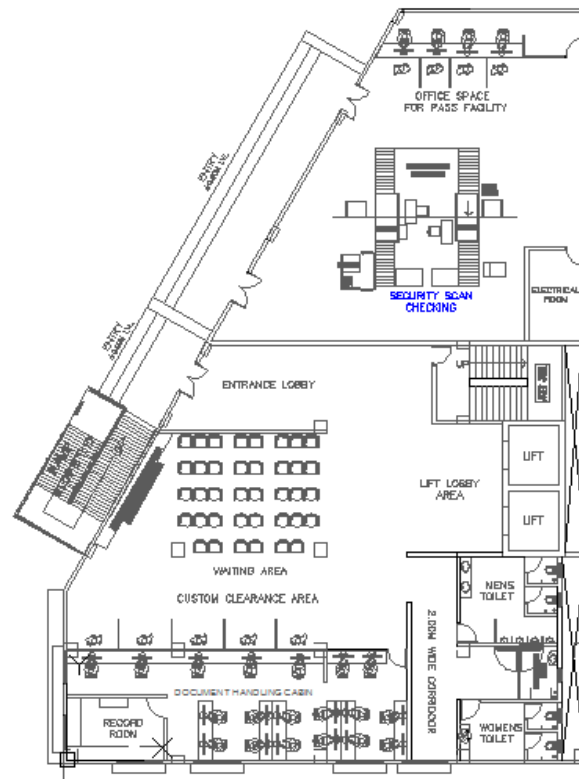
Typical plan Layout of Security Scan Checking Area
